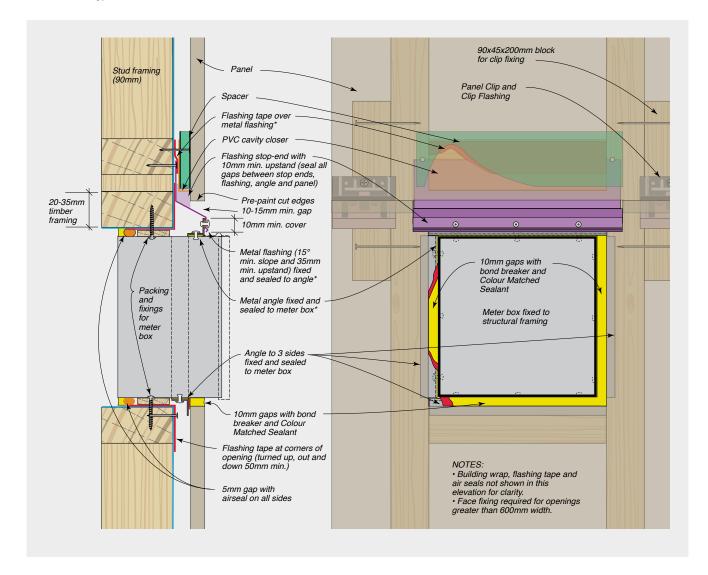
Typical Power Meter Box Installation - Elevation
